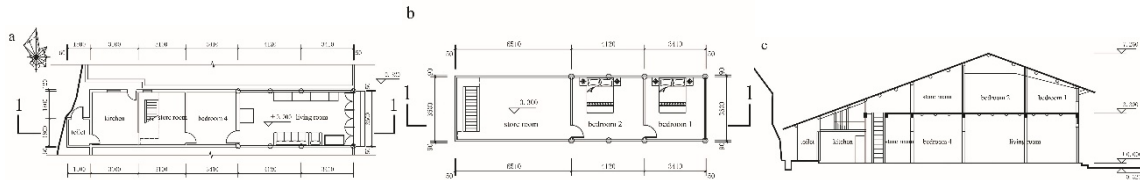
(a) ground floor plan; (b) second floor plan; (c) 1-1 sections.
